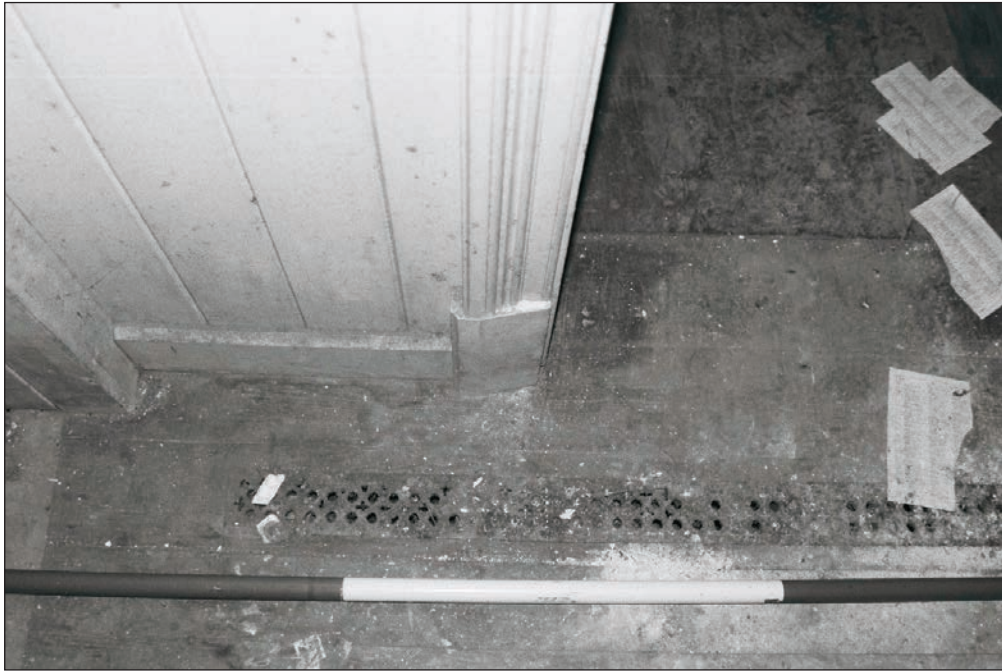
View of vents within the floor of G3, Building 2 (Film 04.08)
